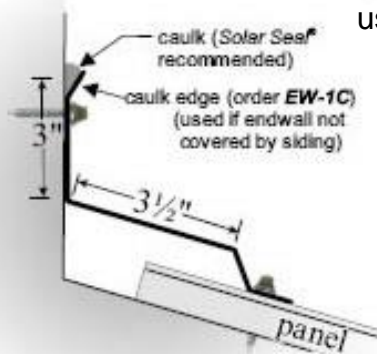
As with the ridge cap, the ENDWALL FLASHING above can be sealed using outside closures.
